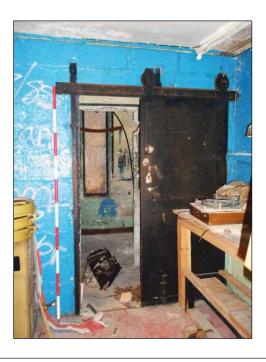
Detail of metal sliding doors at the north end of the west elevation of the projector room, looking west. (2m scale)
